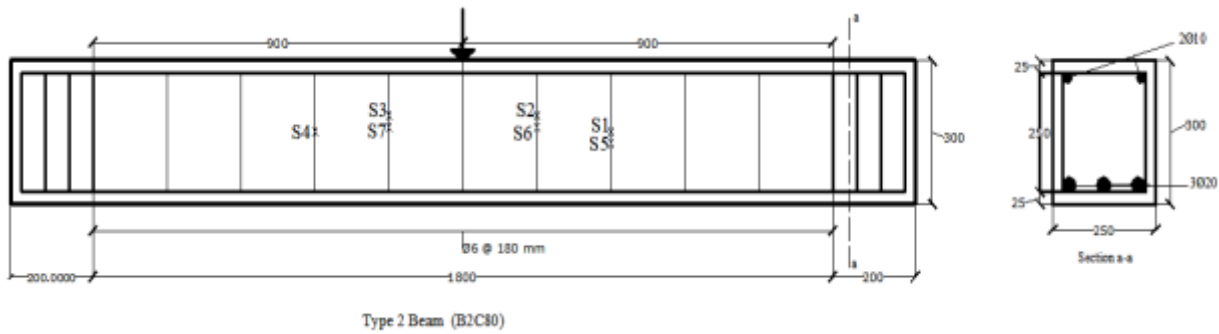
Beam Layout and strain gauge arrangement for B2C80
